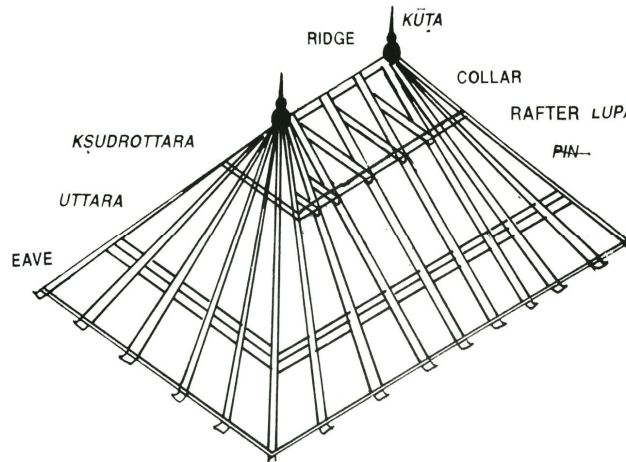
Typical Roof Frame (Source: [Manushyalayachandrika](#))
